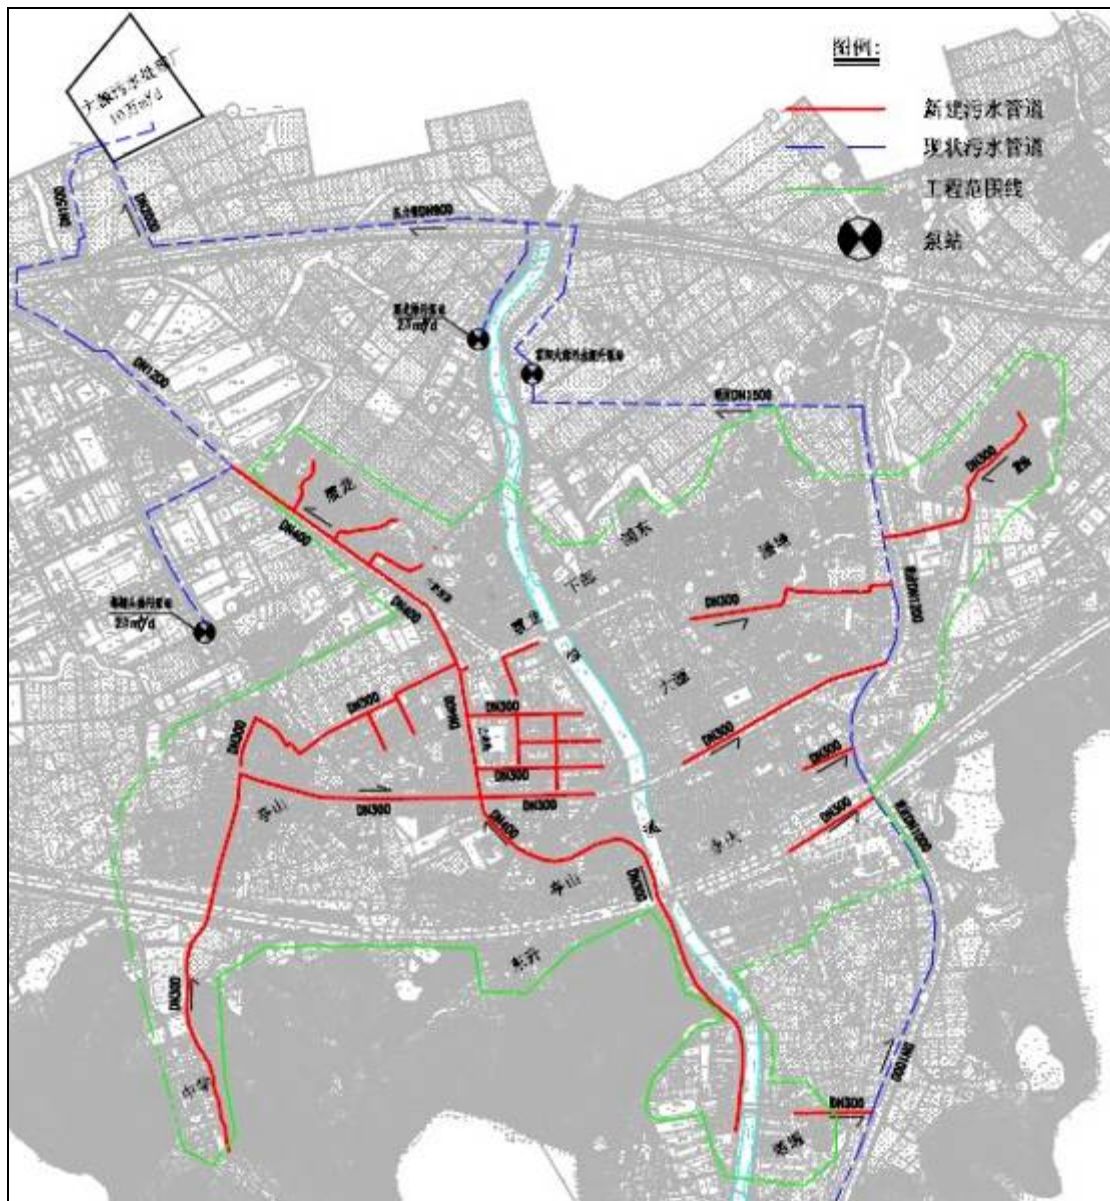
Layout Plan of Sewage Pipe Network in Dayuan Town, Fuyang City
